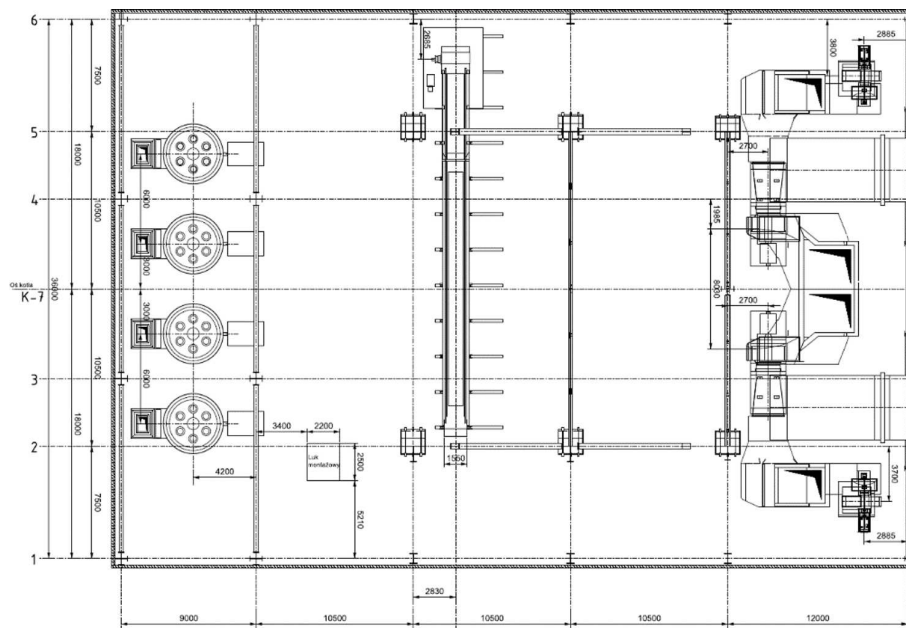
Typical boiler house 0.00-m elevation layout in Polish 200-MWe units.
